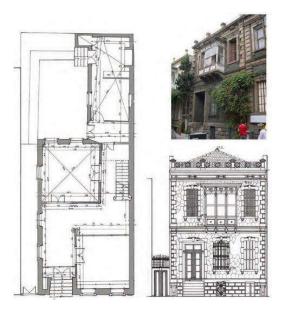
Architectural plan and façade view of a typical 19th century Izmir house (Çıkış, 2009)
